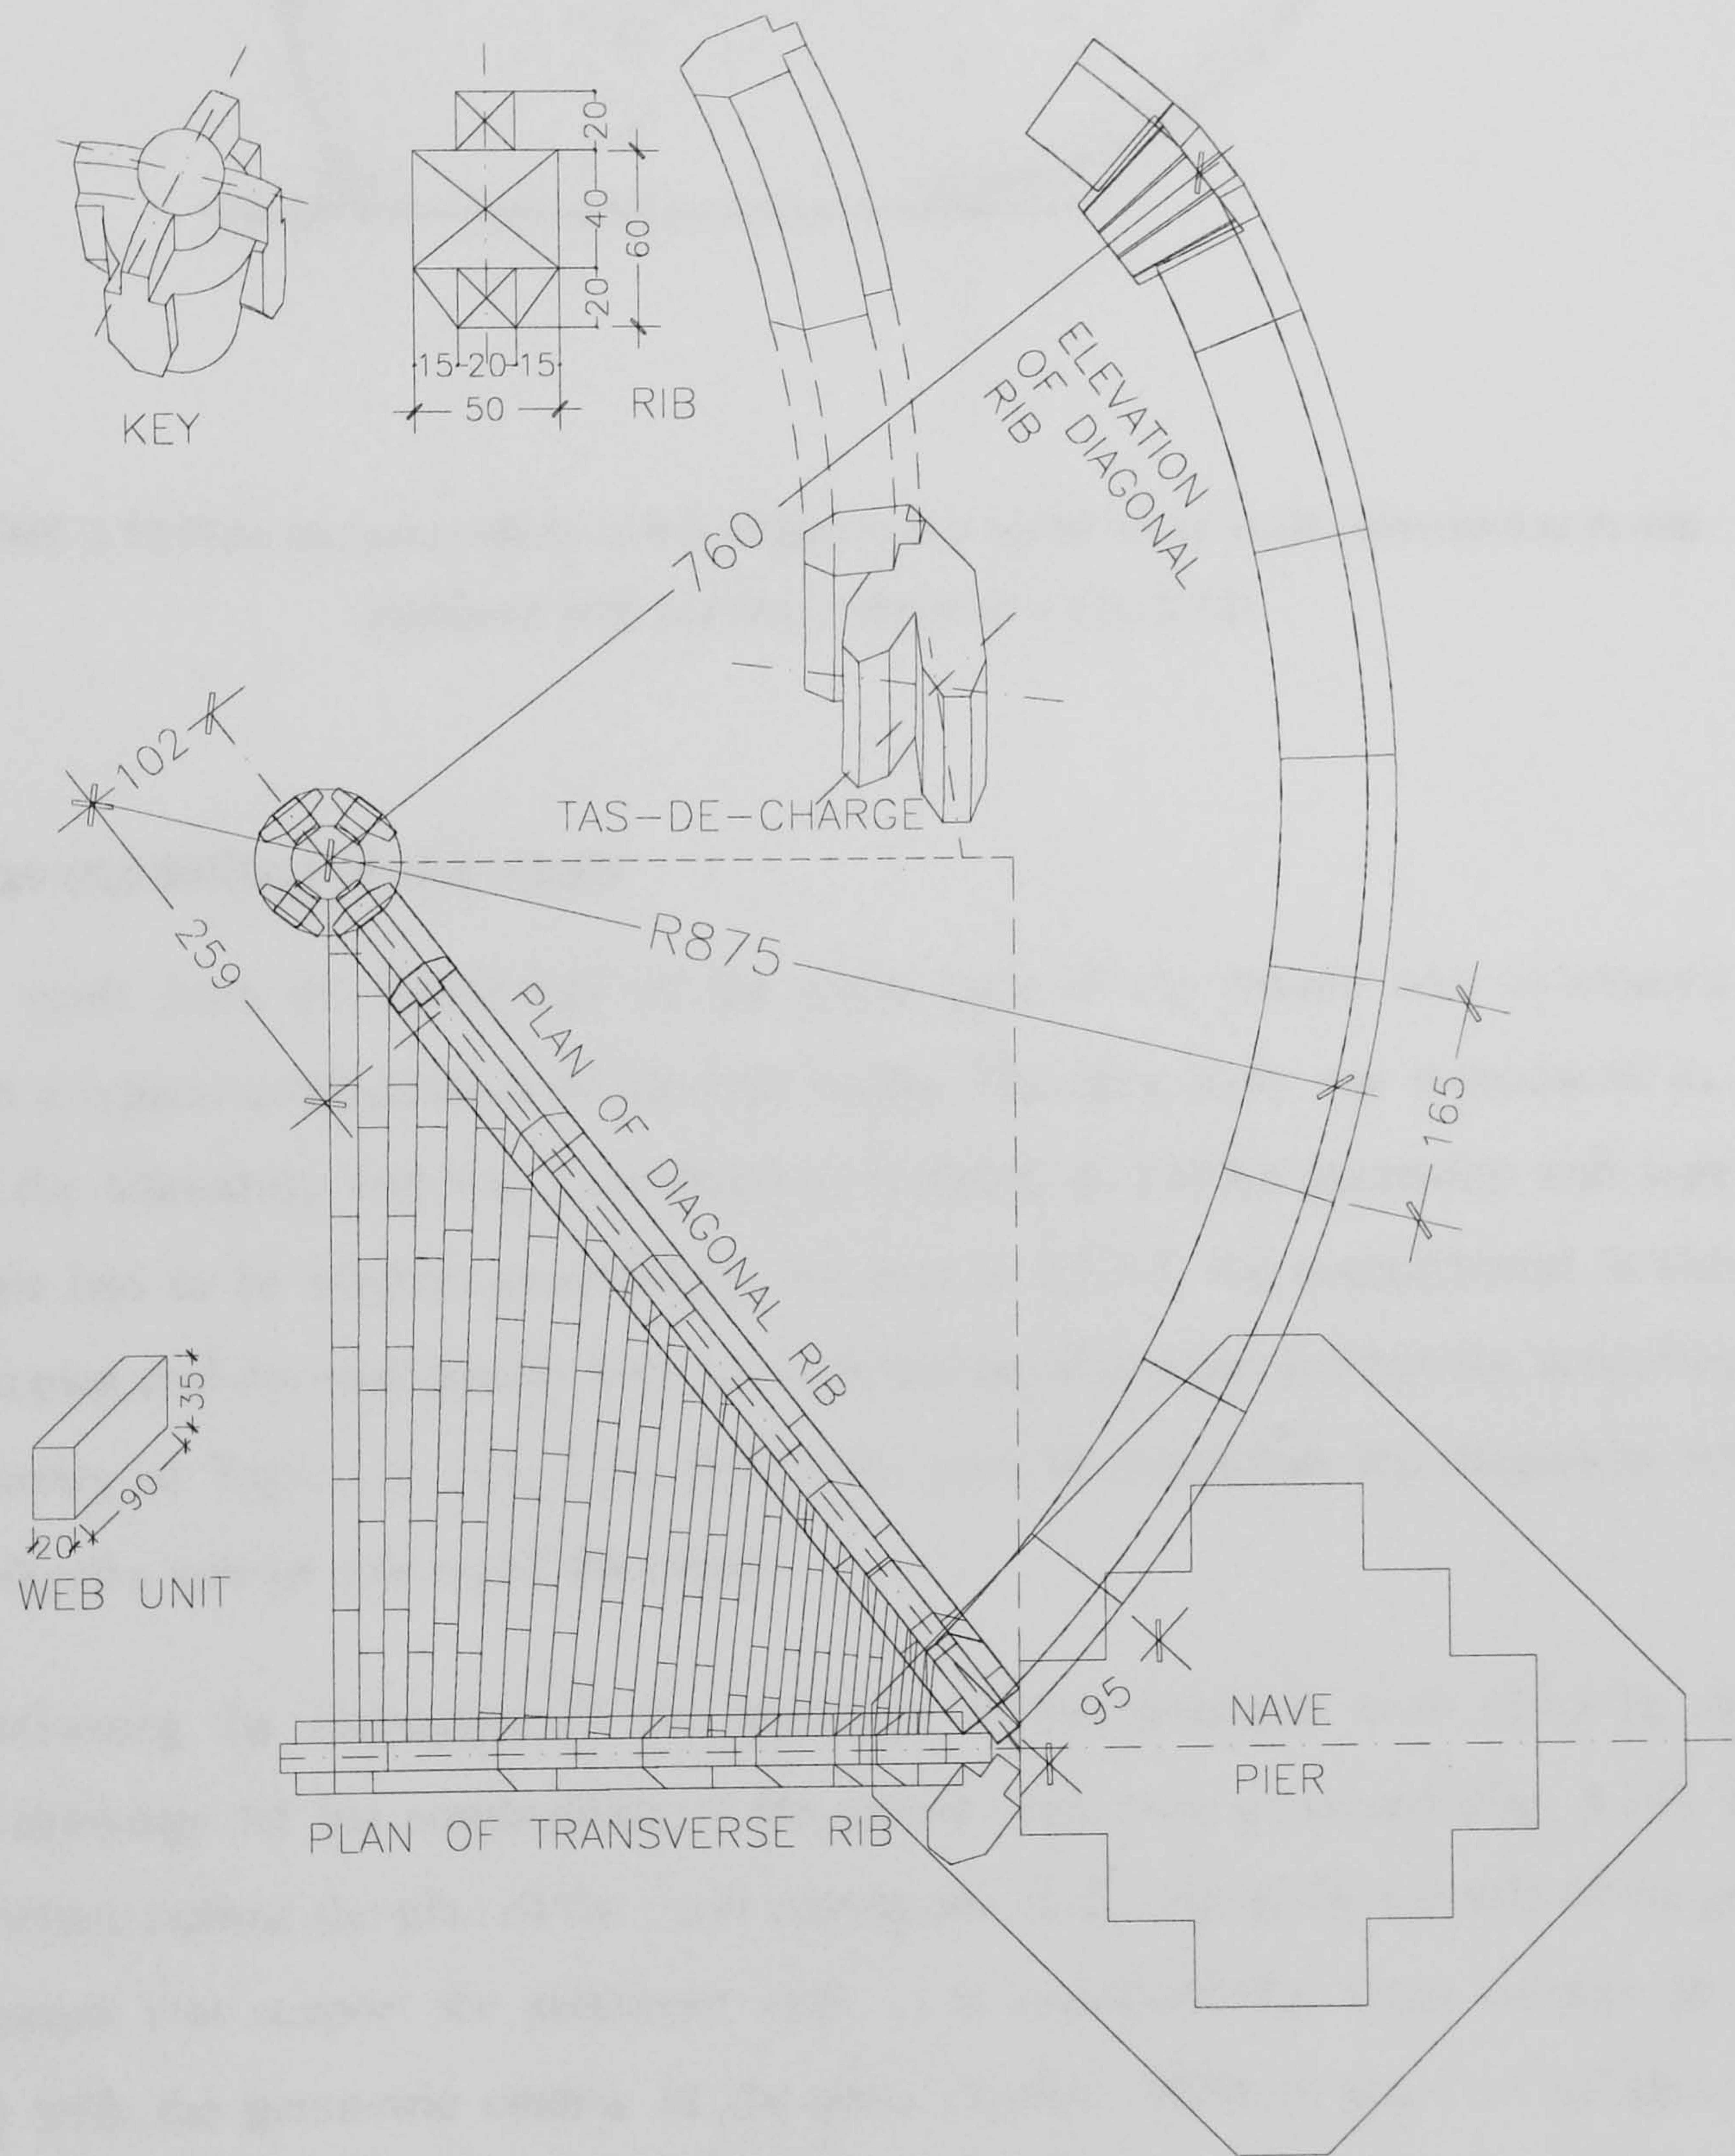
Overall construction drawings of the voussoirs and web units in the model cross vault (dimensions in mm)
